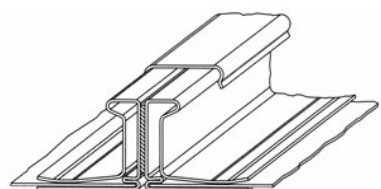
Close up cross-section of a flange for connecting two rectangular ducts. Cleat slides on the top to hold the two flanges together.
